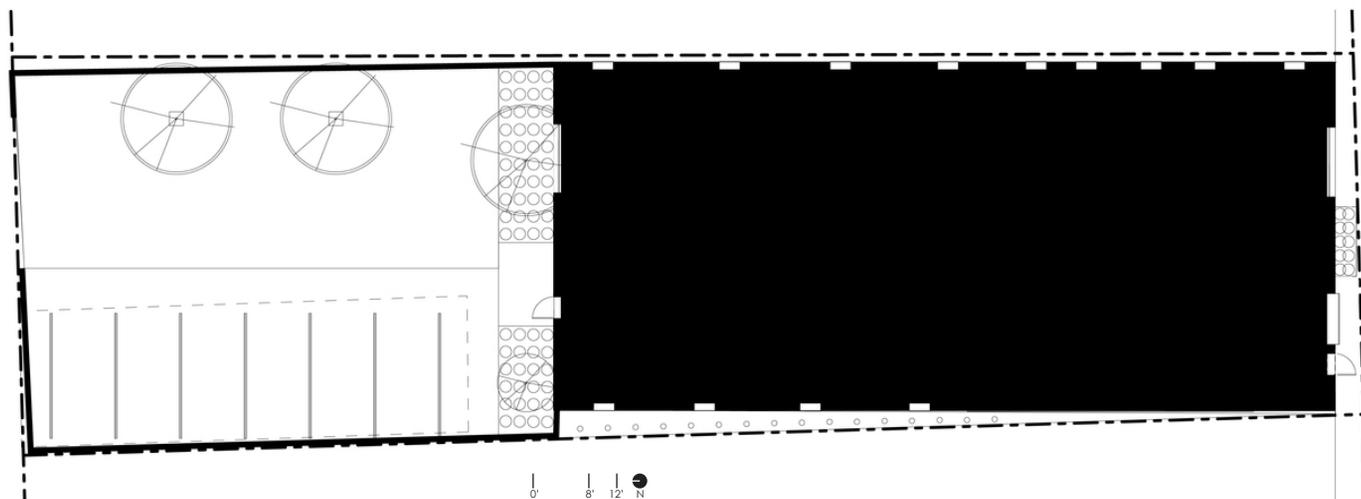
| *Studio 1334*, Site Plan credited to [debartolo architects]
